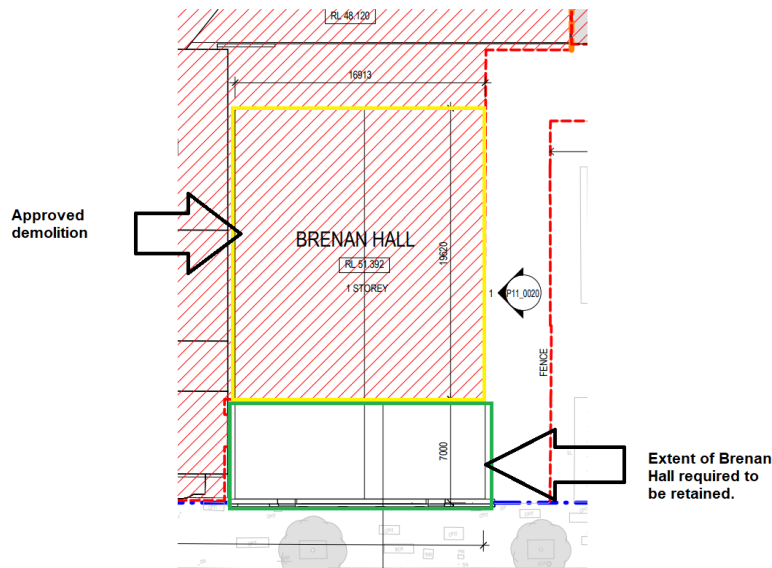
Partial extent of demolition of the Brenan Hall approved under Planning Permit PLN20/0567.
